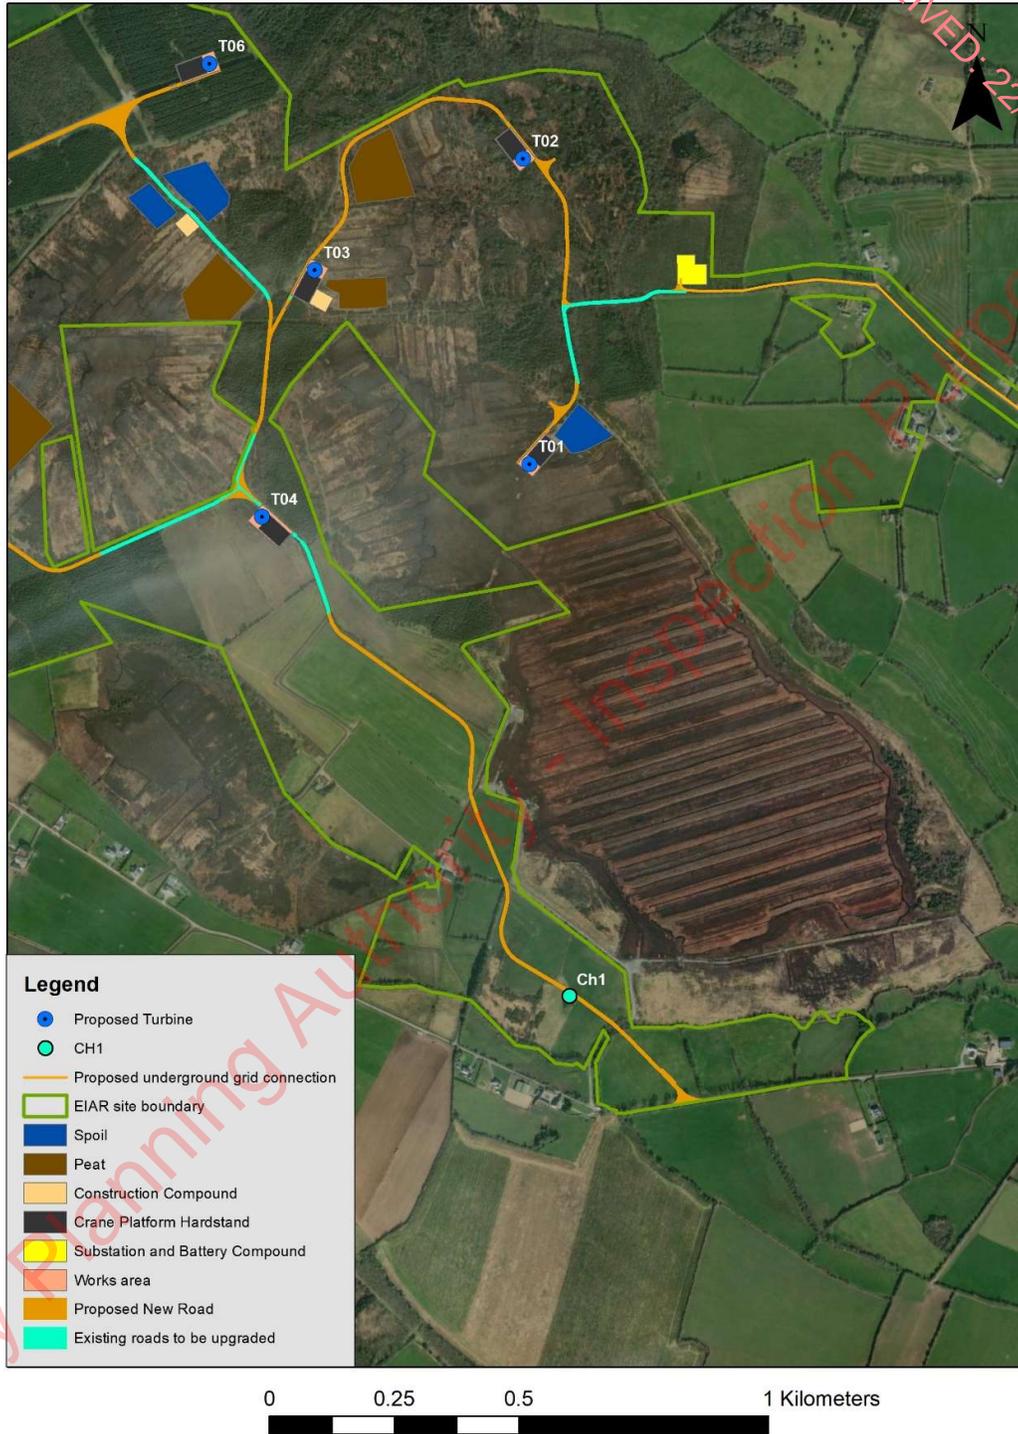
Stone structure CH1 adjacent to proposed new road.
